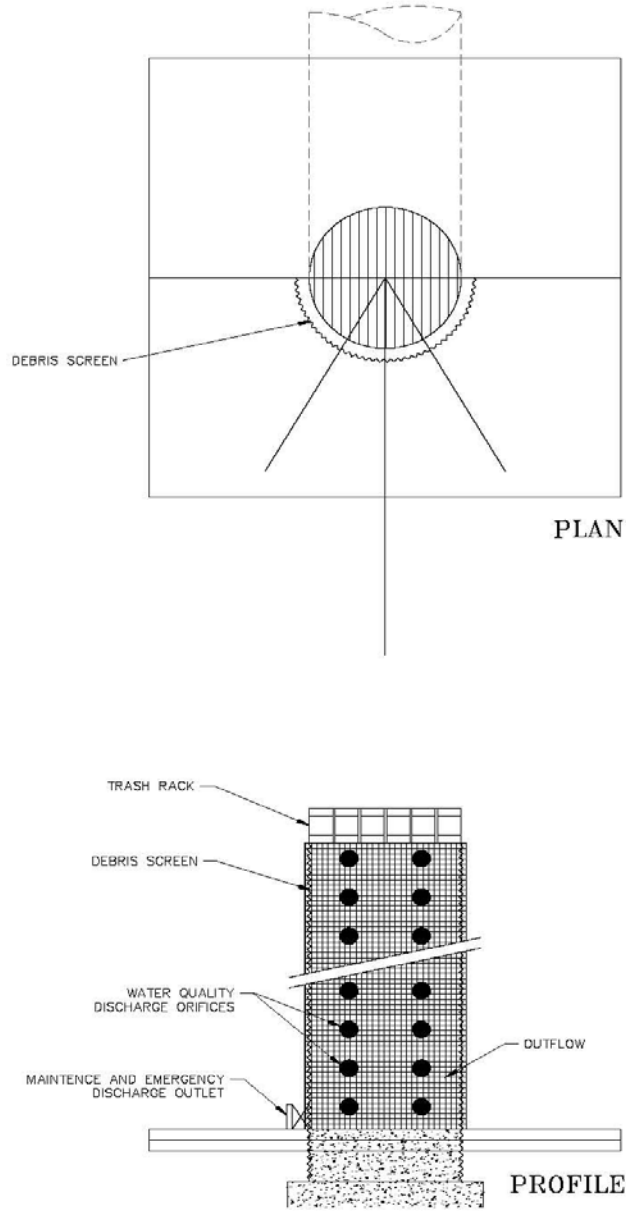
MULTIPLE OFIFICE OUTLET RISER
